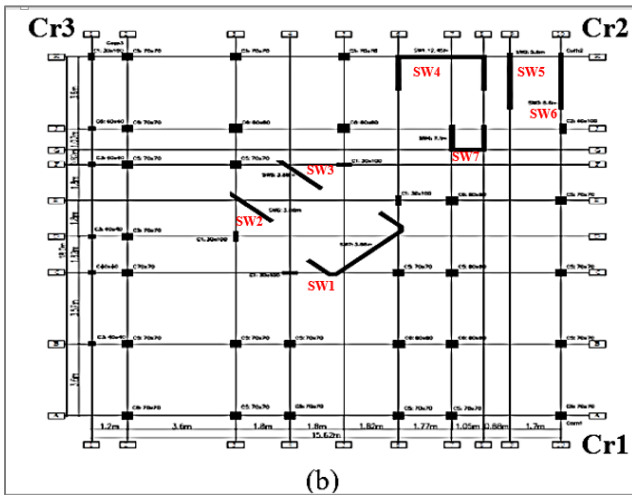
(b) the layout of the columns and shear walls (SW) is depicted on the structure's ground floor plan.
